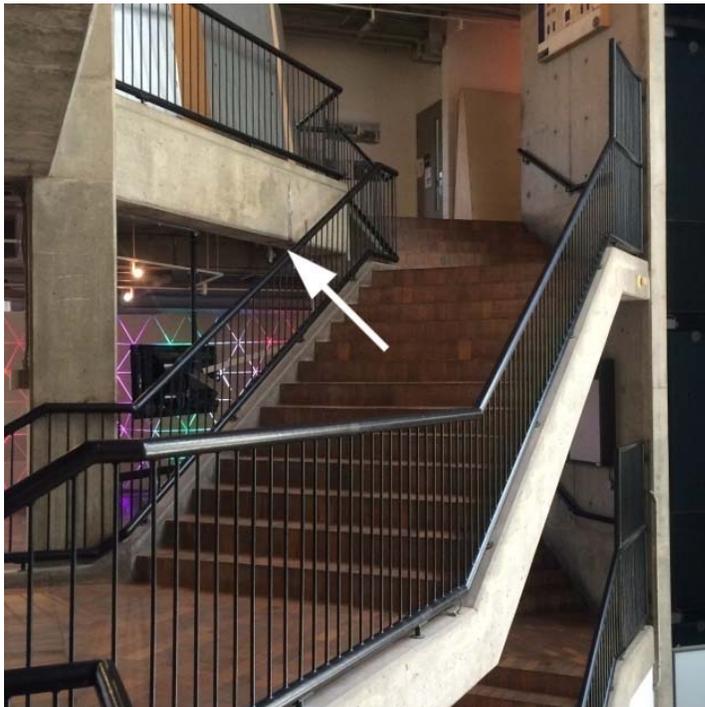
Second floor stairway. Arrow indicates Node 10 installation location.
